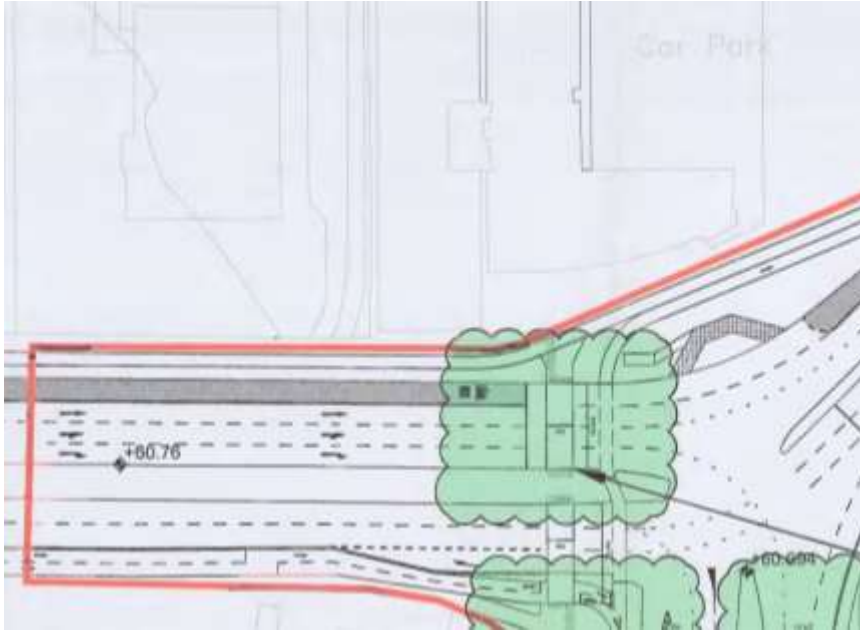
Extract from Proposed Site Layout Sheet 2 of 5 from Reg. Ref. SD21A/0291.
